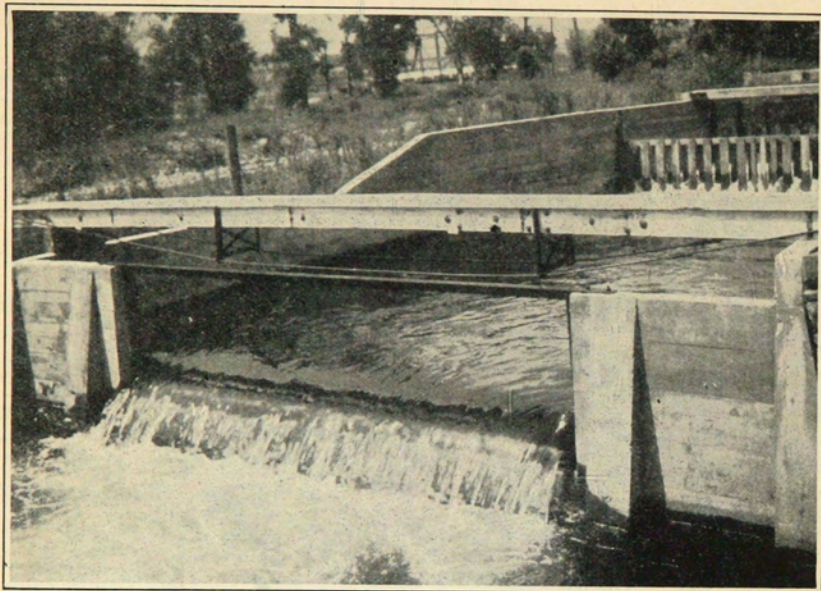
Fifteen-foot Standard Rectangular Weir at the Bellvue Hydraulic Laboratory. Discharge 40 Second-feet. Actual Length of Crest, 14.98 feet.
